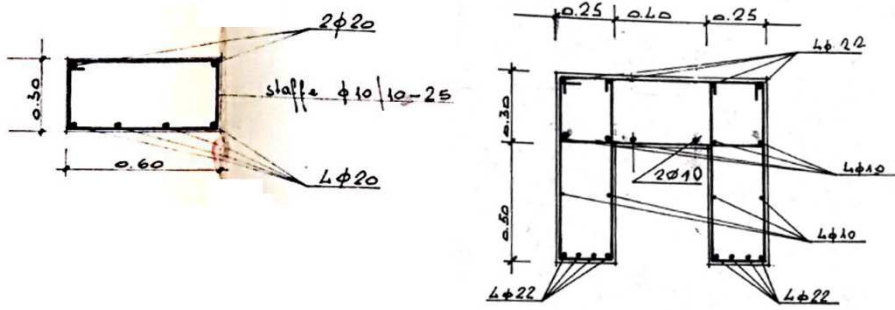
Cross-sections of longitudinal (left) and transversal (right) beams in the middle of the span (adapted from original drawings)
